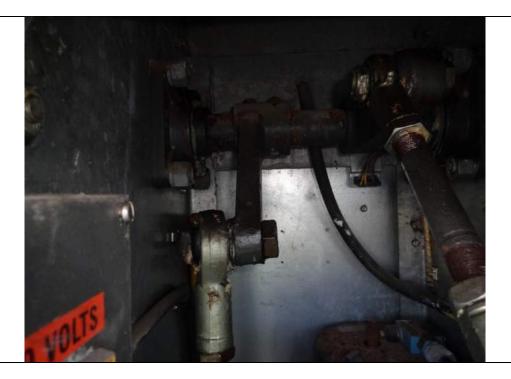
[SW Traffic Gate] - Levers exhibit slight deformation and misalignment.
